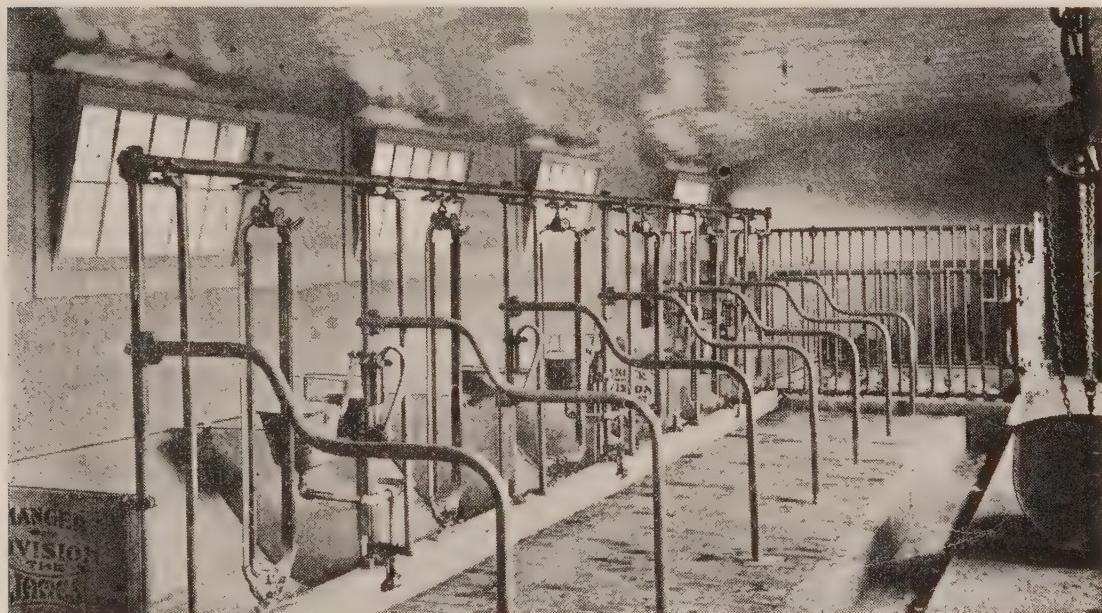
A substantially built cow stable. Note the deep cement gutter and the cork brick floor where the cows are to stand.
